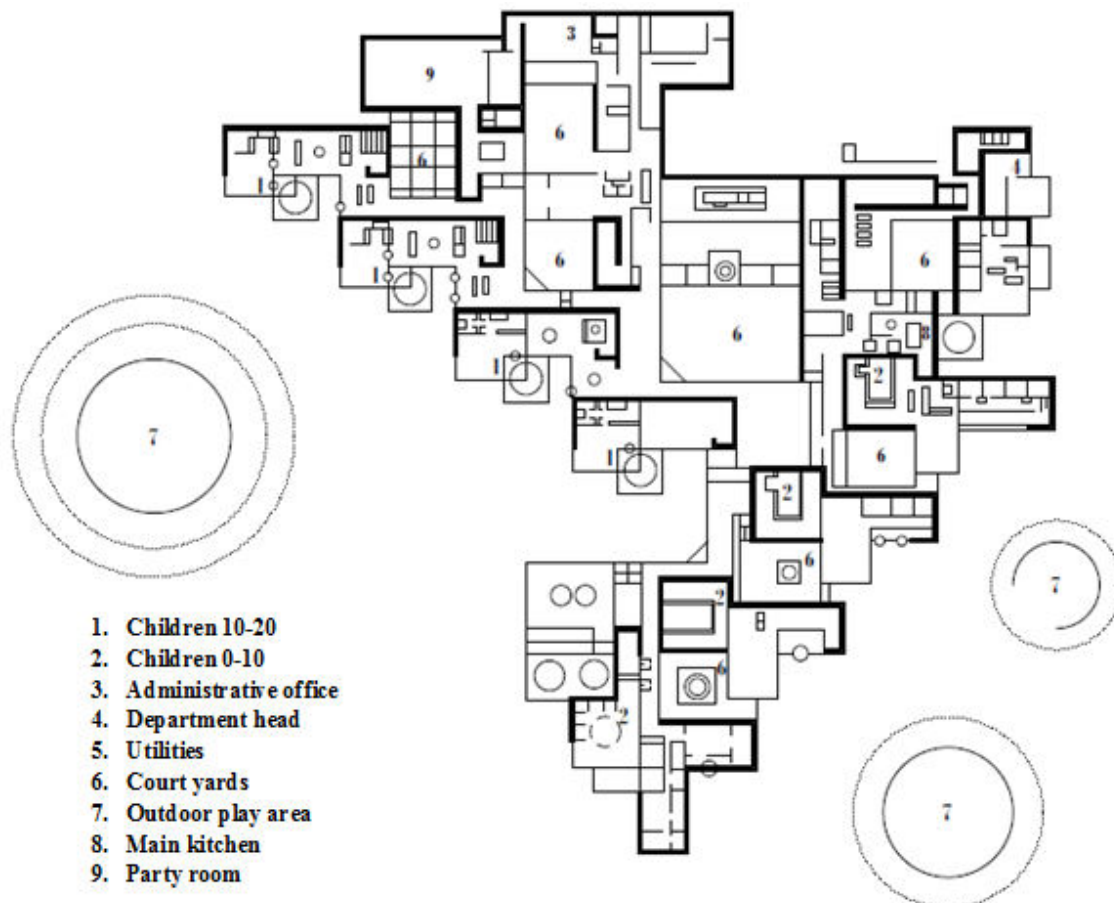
Amsterdam Orphanage Ground Floor Plan
